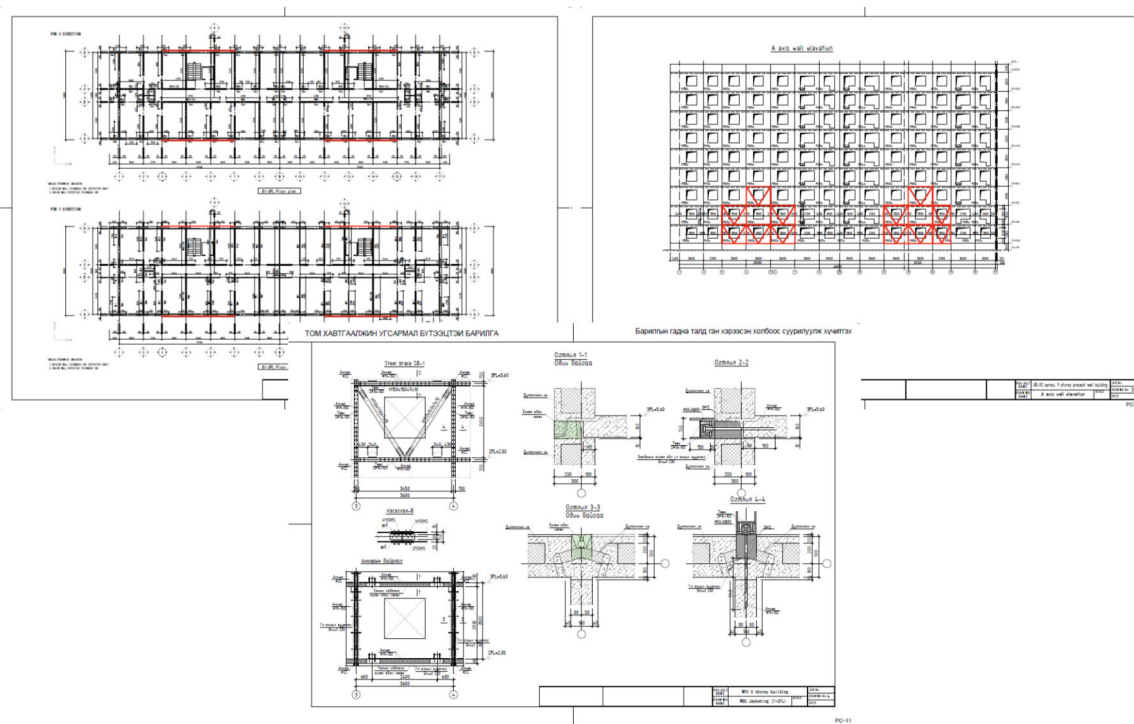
Example of Strengthening the PC building by Outer Frame
